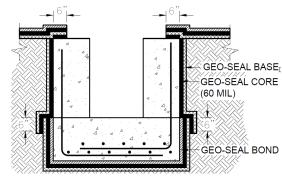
Detail showing chemical vapor barrier sealing of an elevator pit
